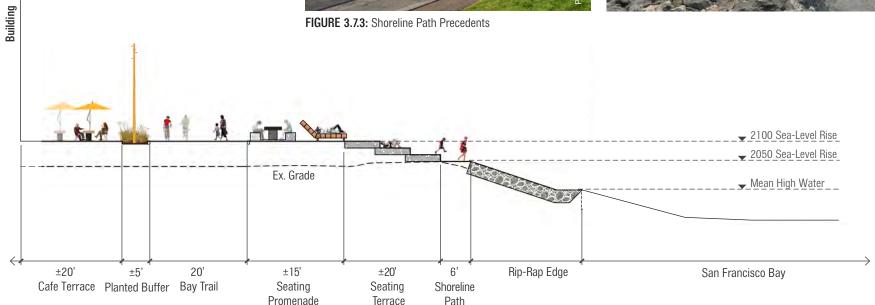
Illustrative Waterfront Promenade Section A-A Note: All dimensions and elevations are illustrative only.
